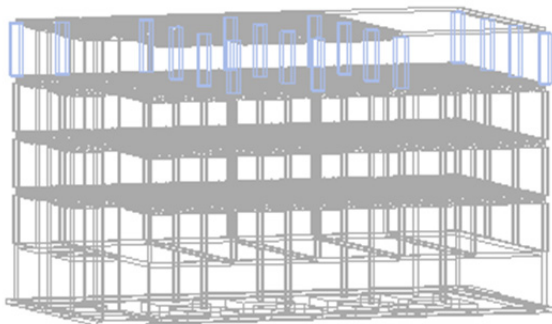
Glue-laminated columns supporting the beams of the roof construction.
